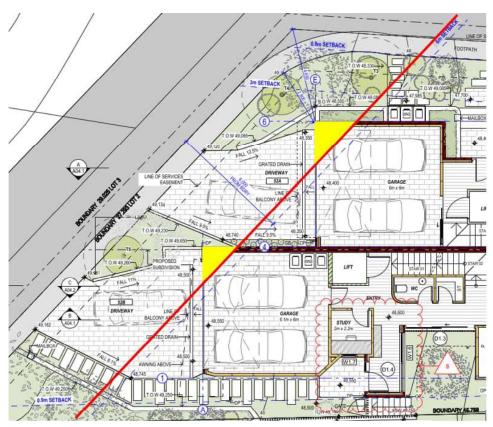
Extract of Site Plan showing front 6m setback lines in red and building encroachments in yellow.
